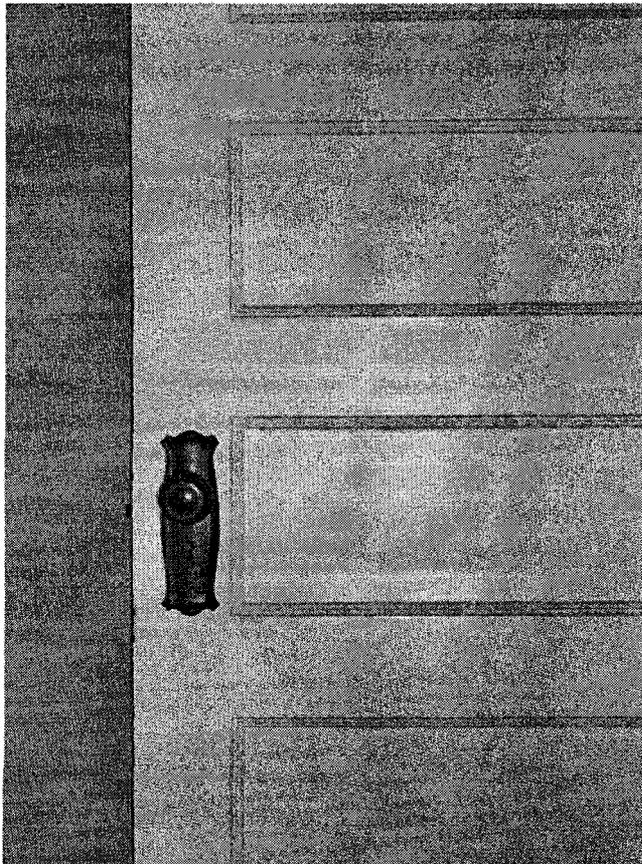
Door detail, used throughout the house, on the door between the hallway and the third chamber.
